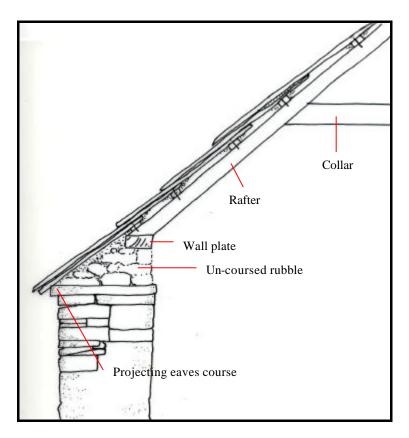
Partial section through stone slated roof showing eaves detail, collared rafter roof, wall plate, torching & courses.
